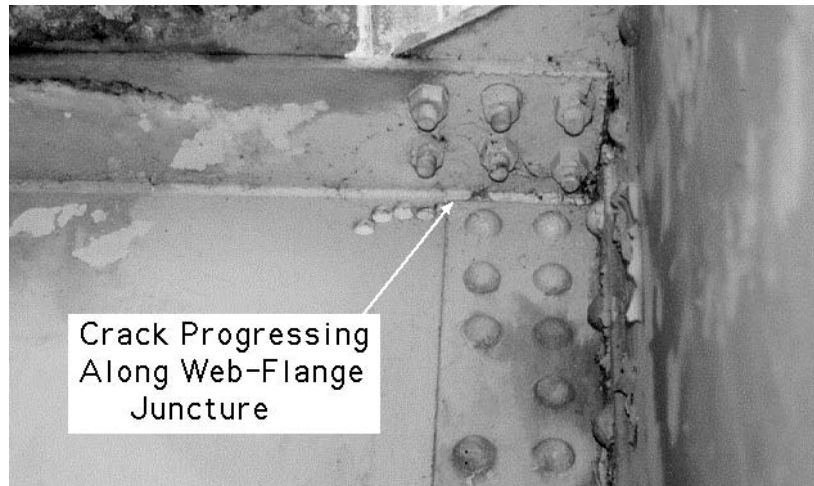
Floorbeam Cracking Due to Relative Twist Between Floorbeam and Superstructure
